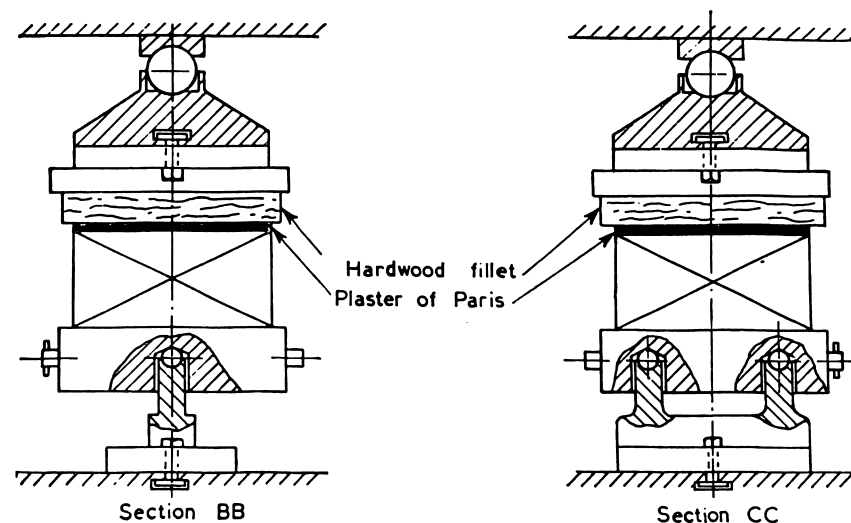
Arrangement of loading for transverse strength test: end elevations
